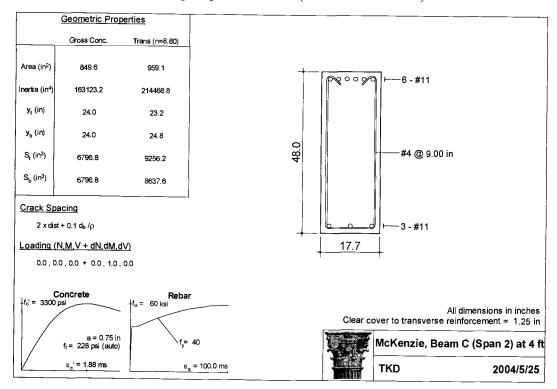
McKenzie R. Bridge; Span 2 at 4 ft. (RESPONSE 2000TM)
